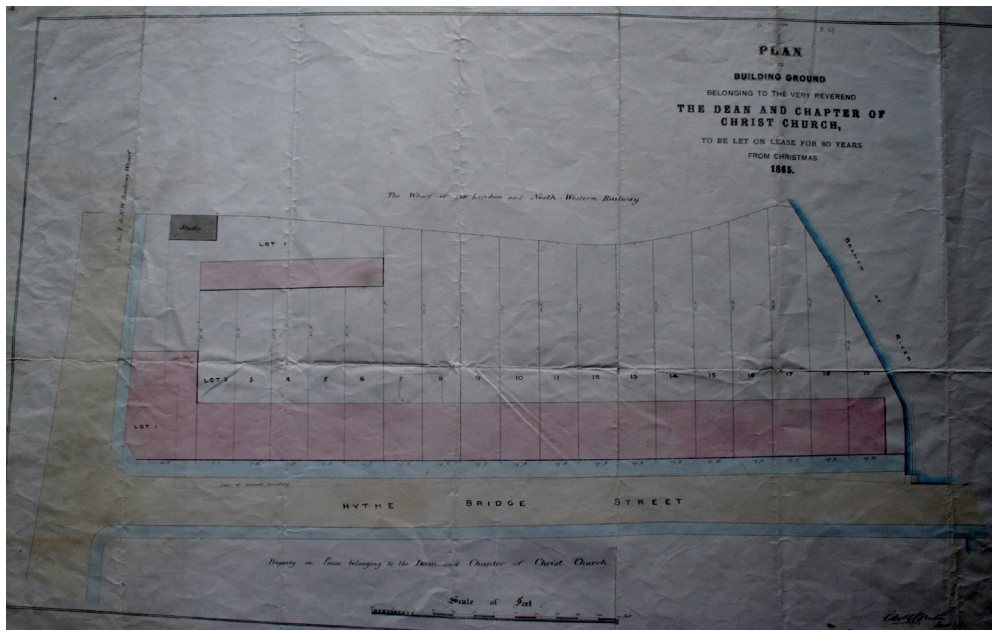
Plan of building plots on the north side of Hythe Bridge Street to be let from Christmas 1865. CCA, Maps St Thomas 22 and 23.
